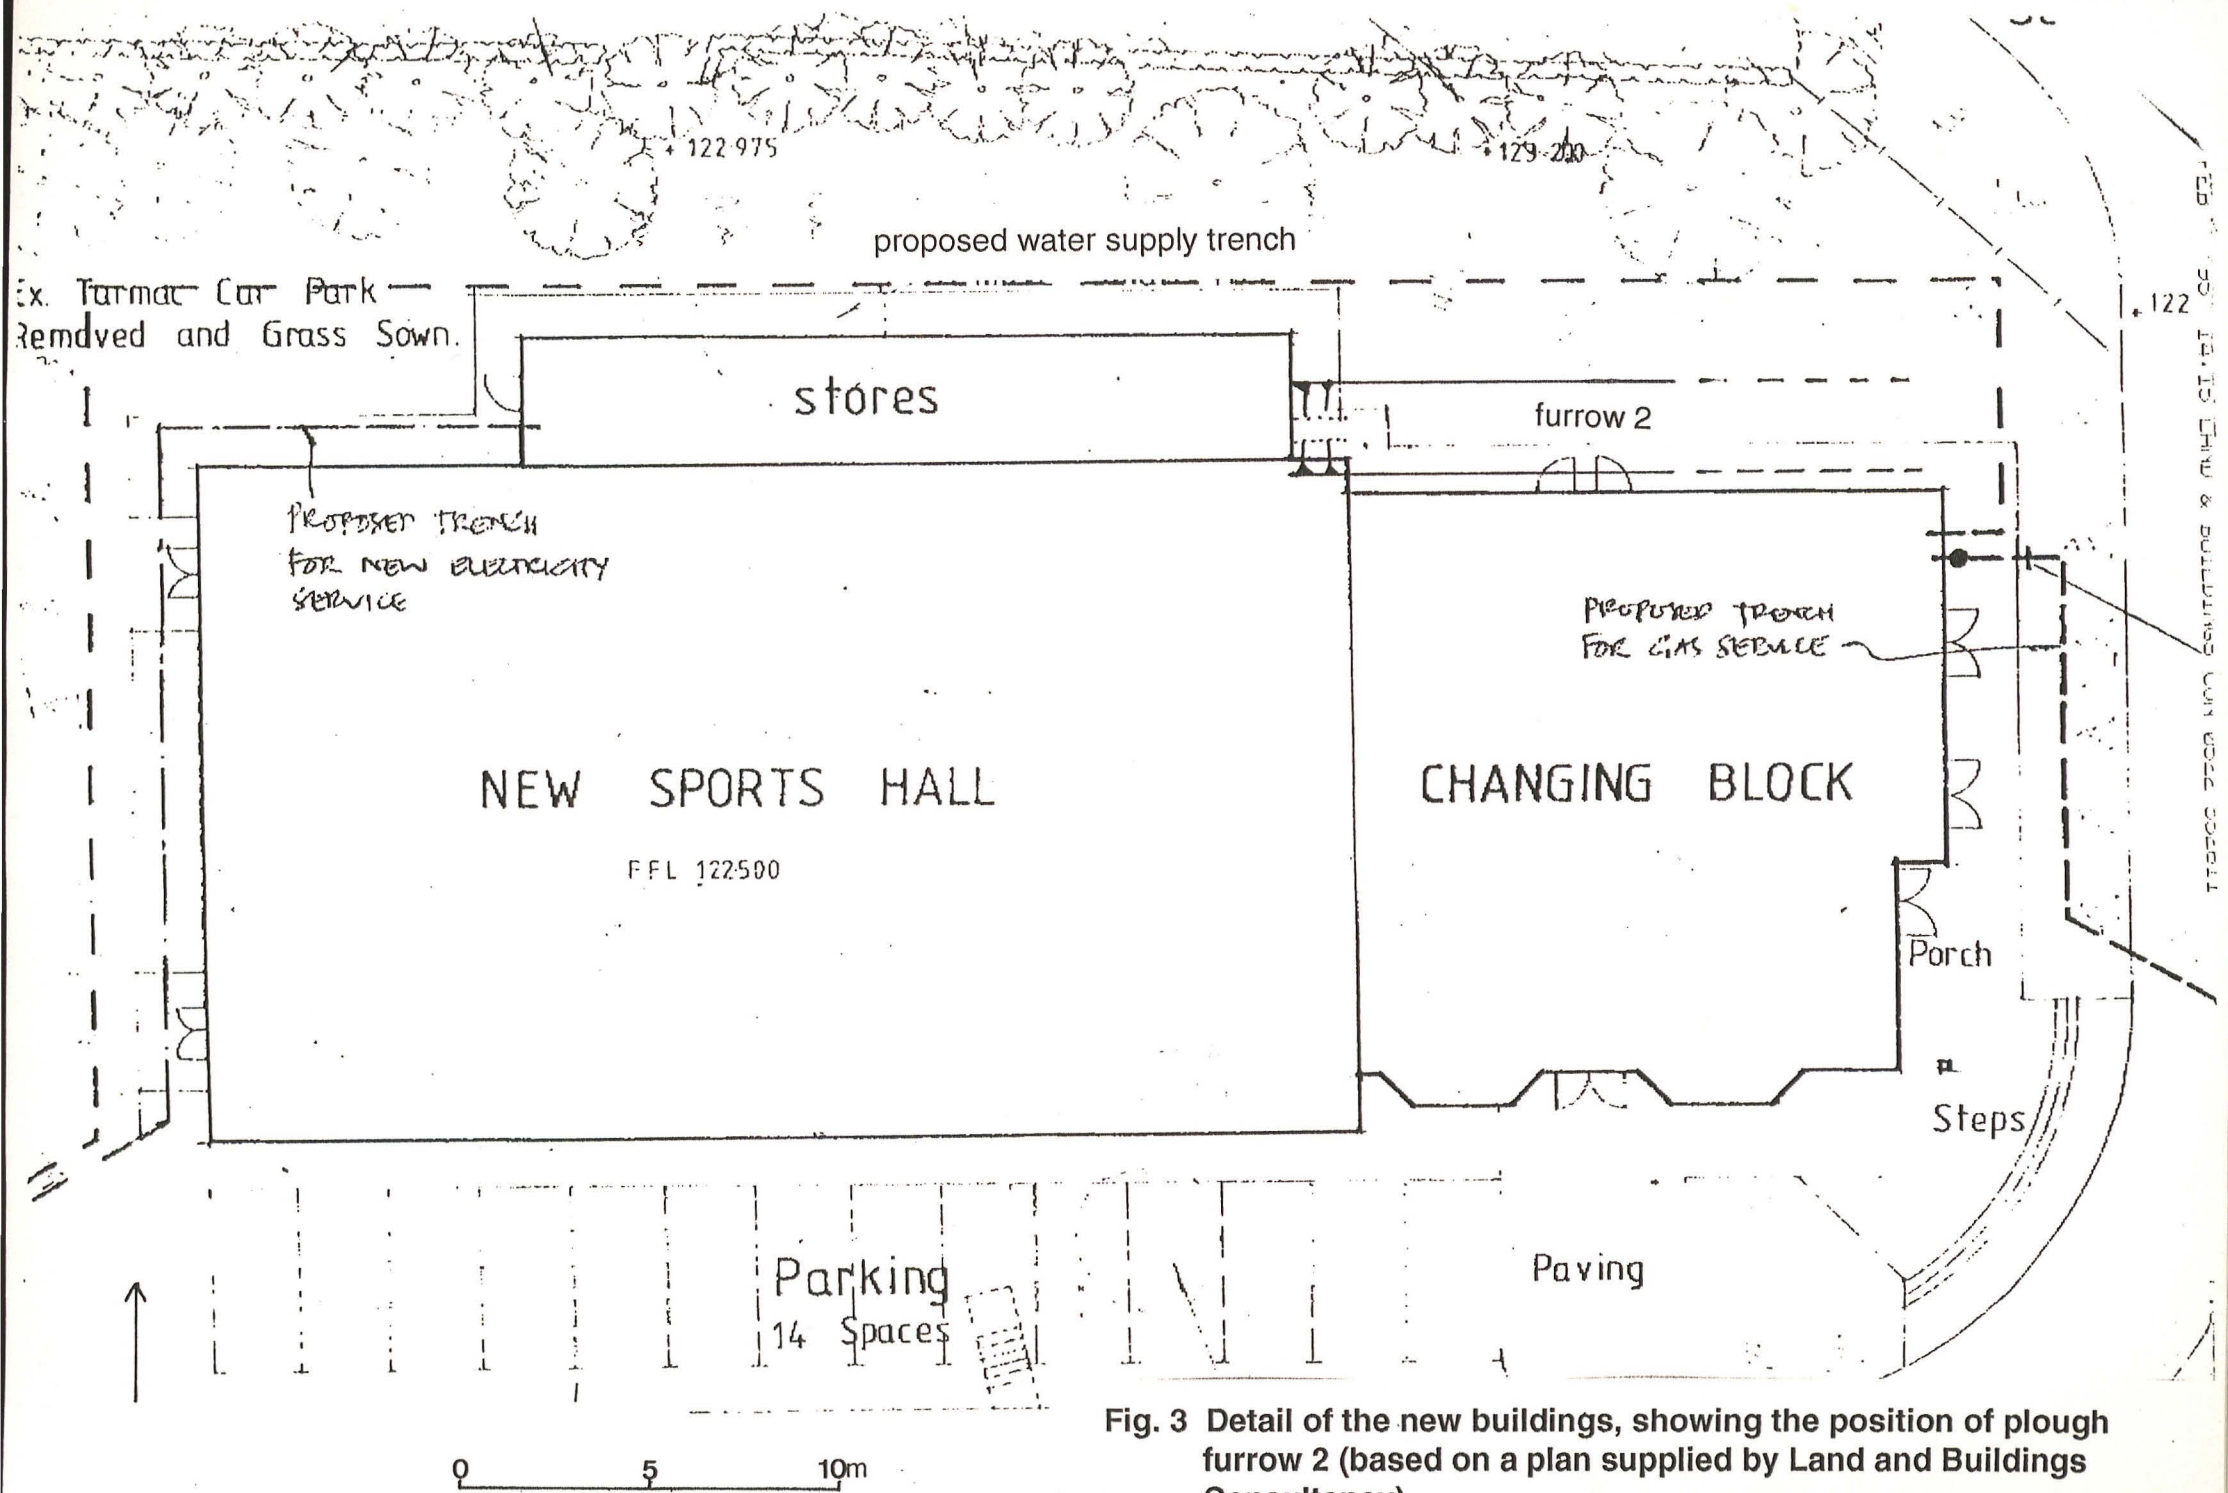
Detail of the new buildings, showing the position of plough furrow 2 (based on a plan supplied by Land and Buildings Consultancy)
